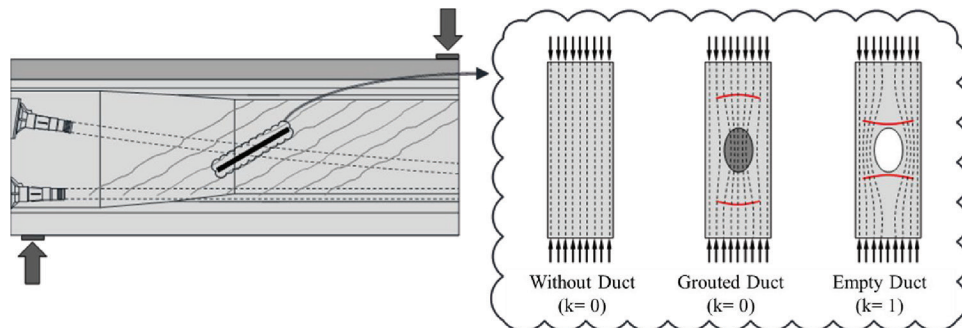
Internal compressive stress flow in web of post-tensioned girder and concrete panel analogy of specimens without duct, grouted duct, and empty duct.<sup>25</sup>
